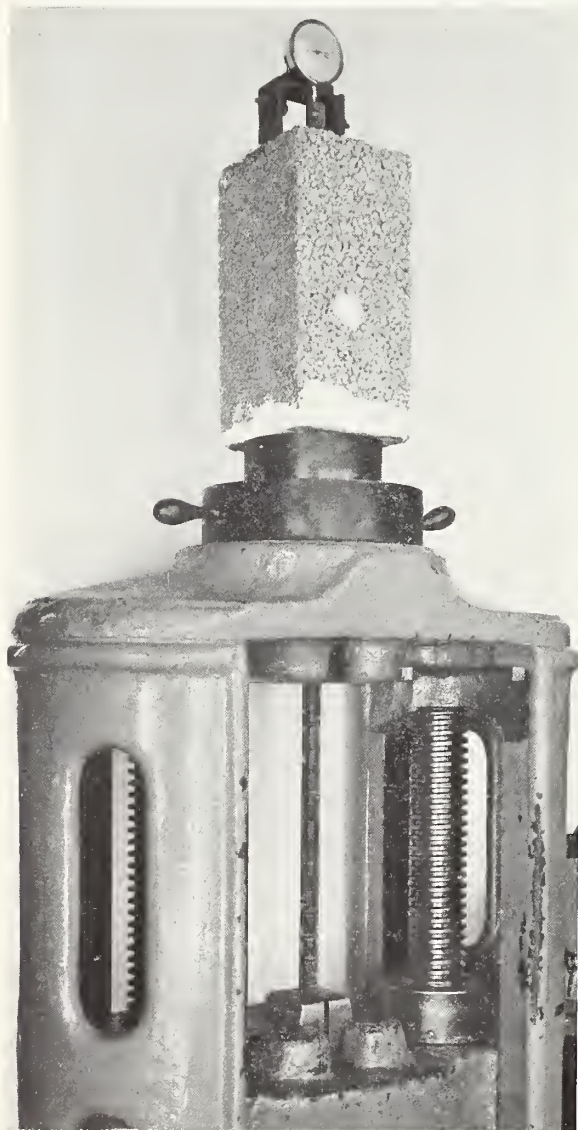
Porous-concrete specimen in bond pull-out test.
